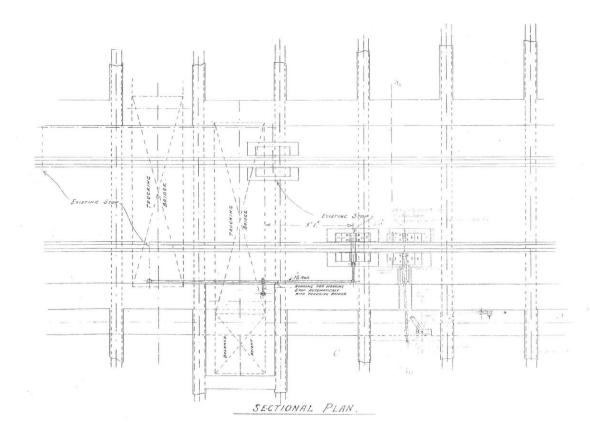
1923 plan showing Trucking Bridges and Wagon Stops.
